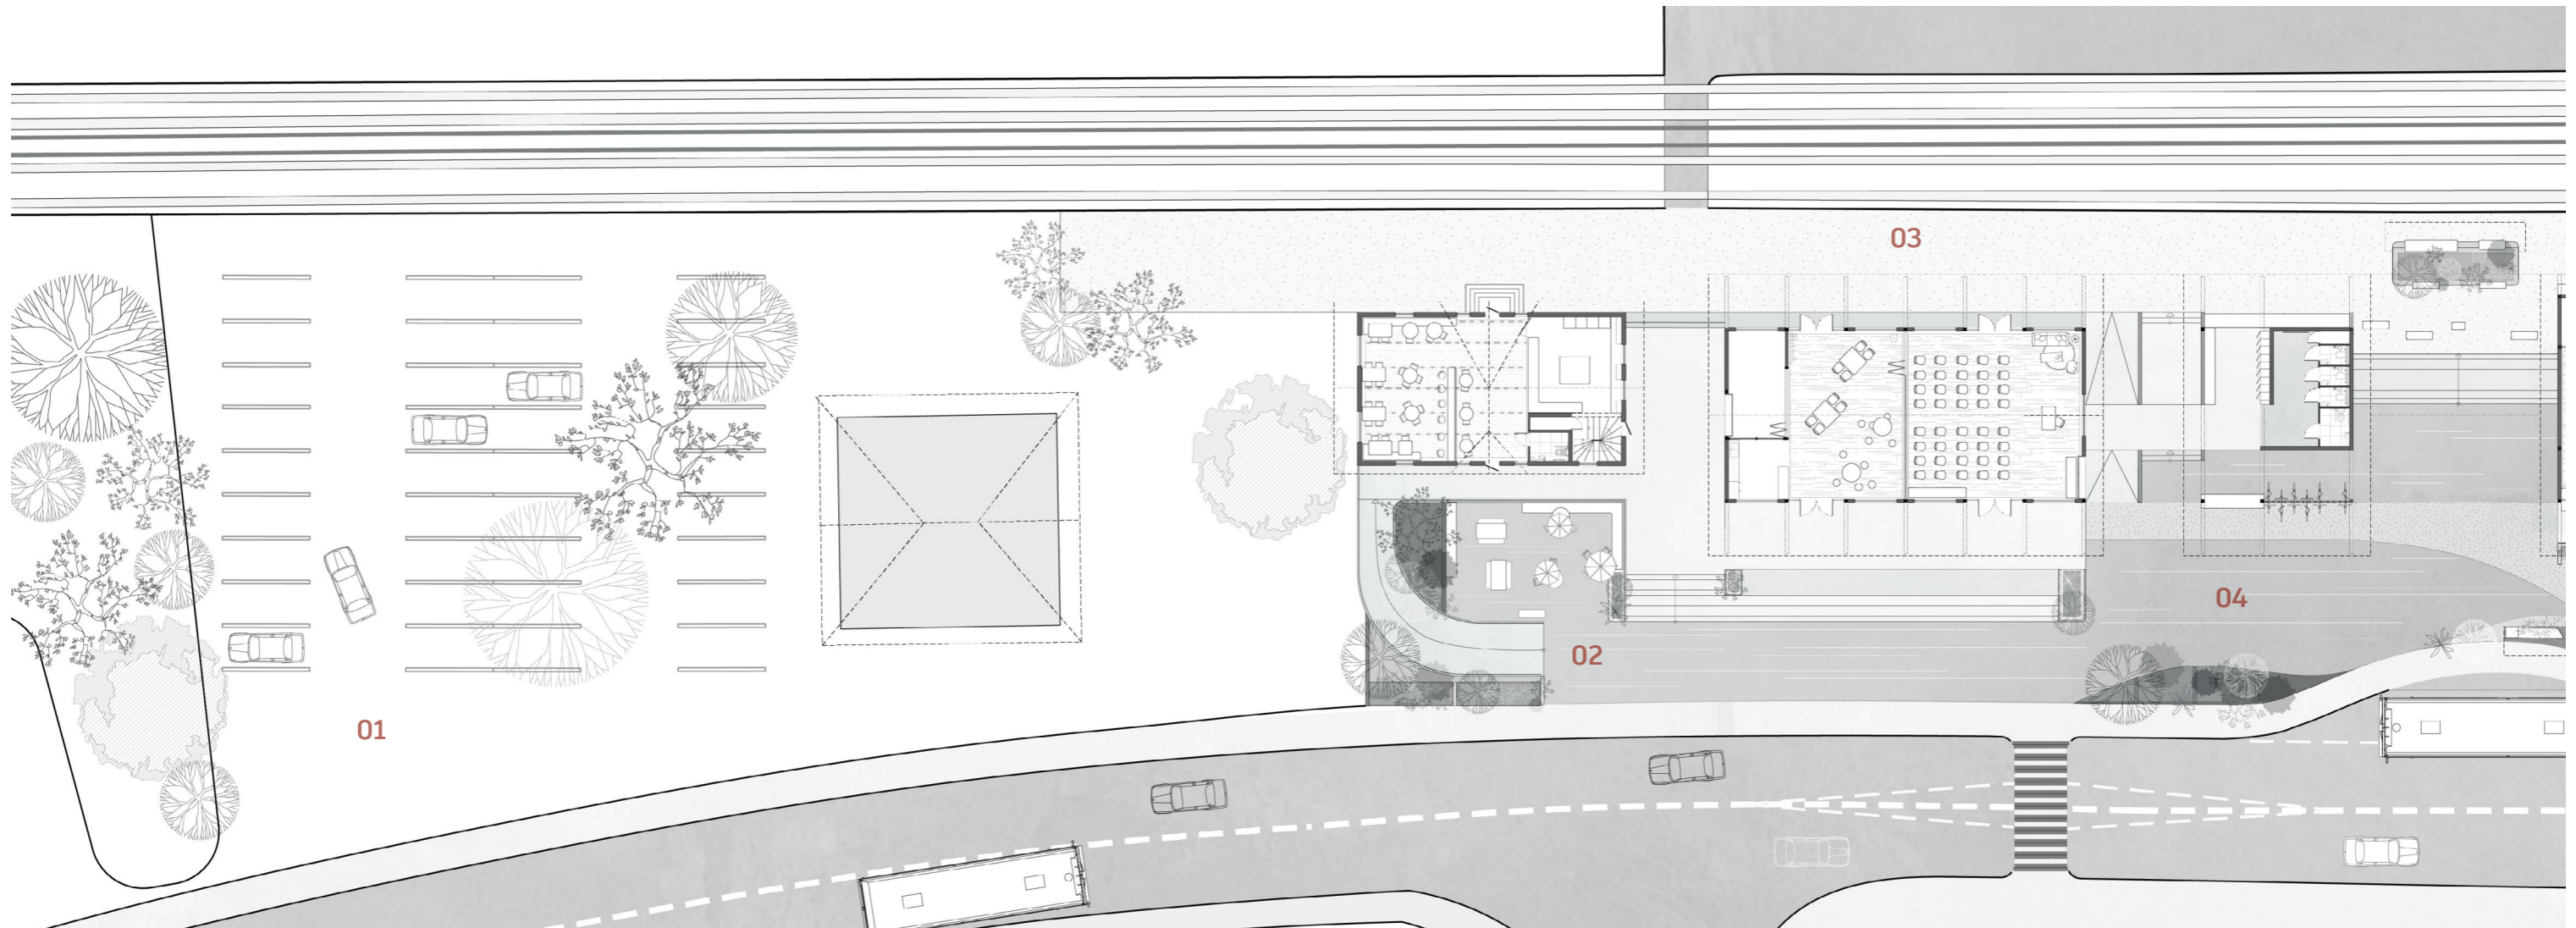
Part Site Plan (1) - Sandareds Hjärta
